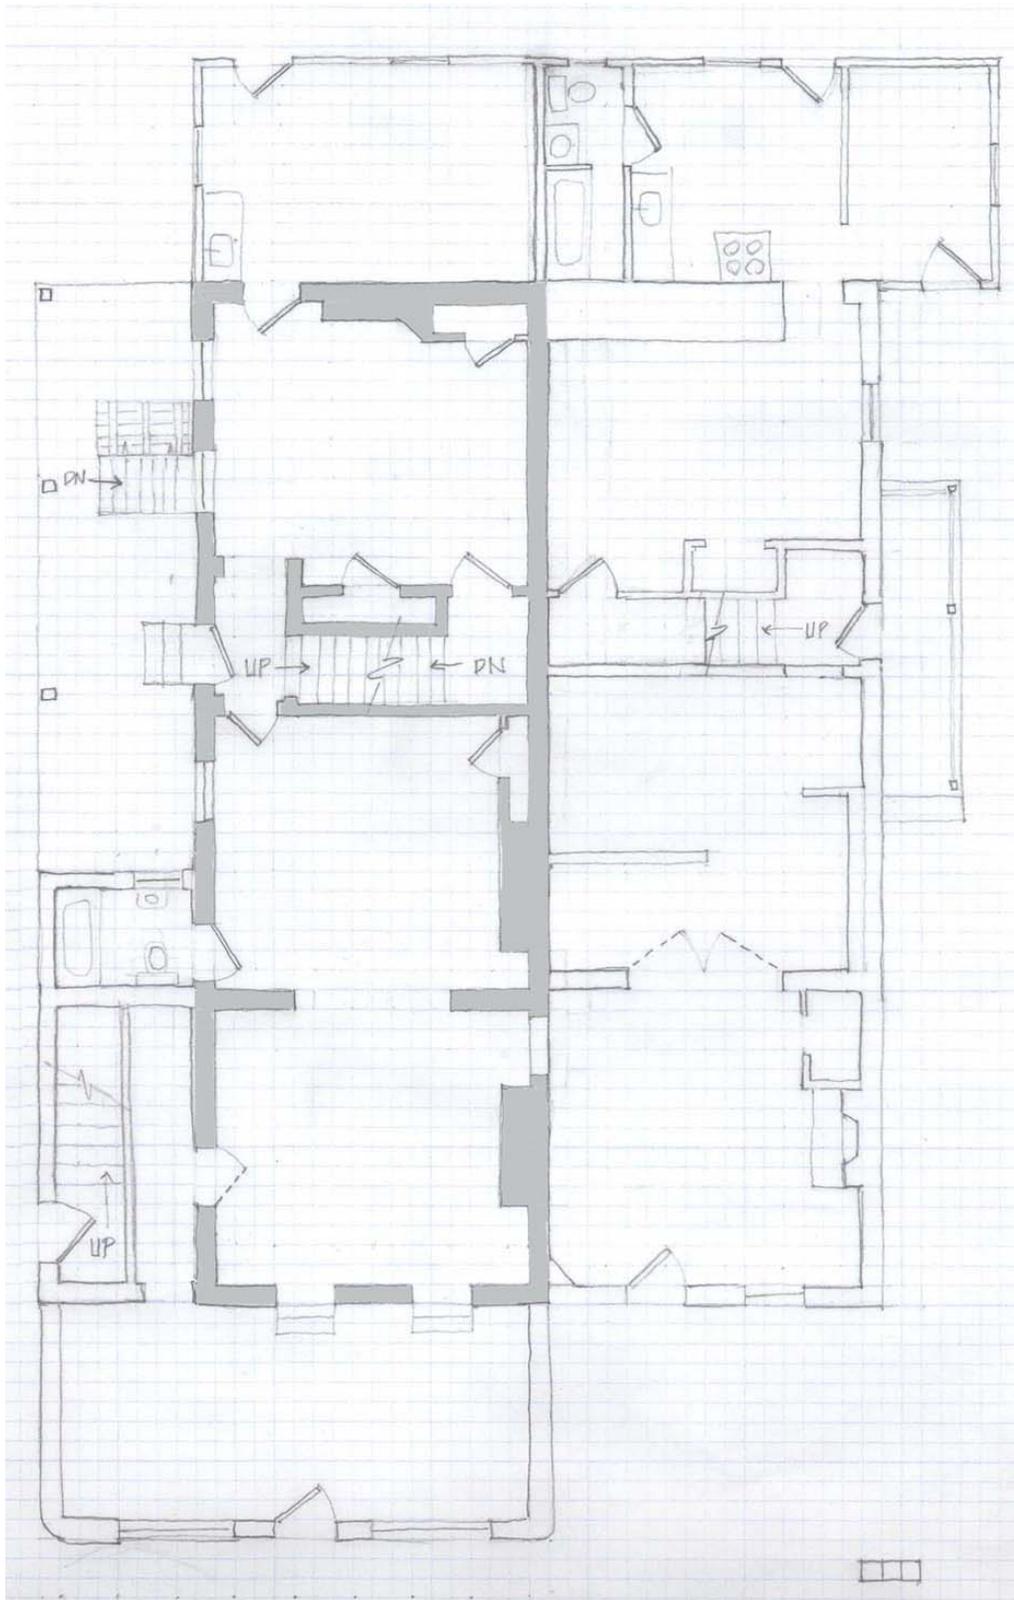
17-15 East 12th Street, first floor plan, drawing by Bill Macintire. First period, # 17, is shaded.
